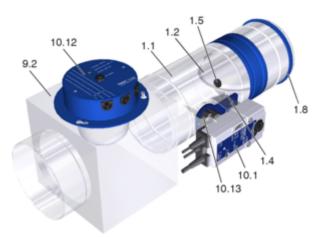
FKRS-EU with spring return actuator and duct smoke detector
